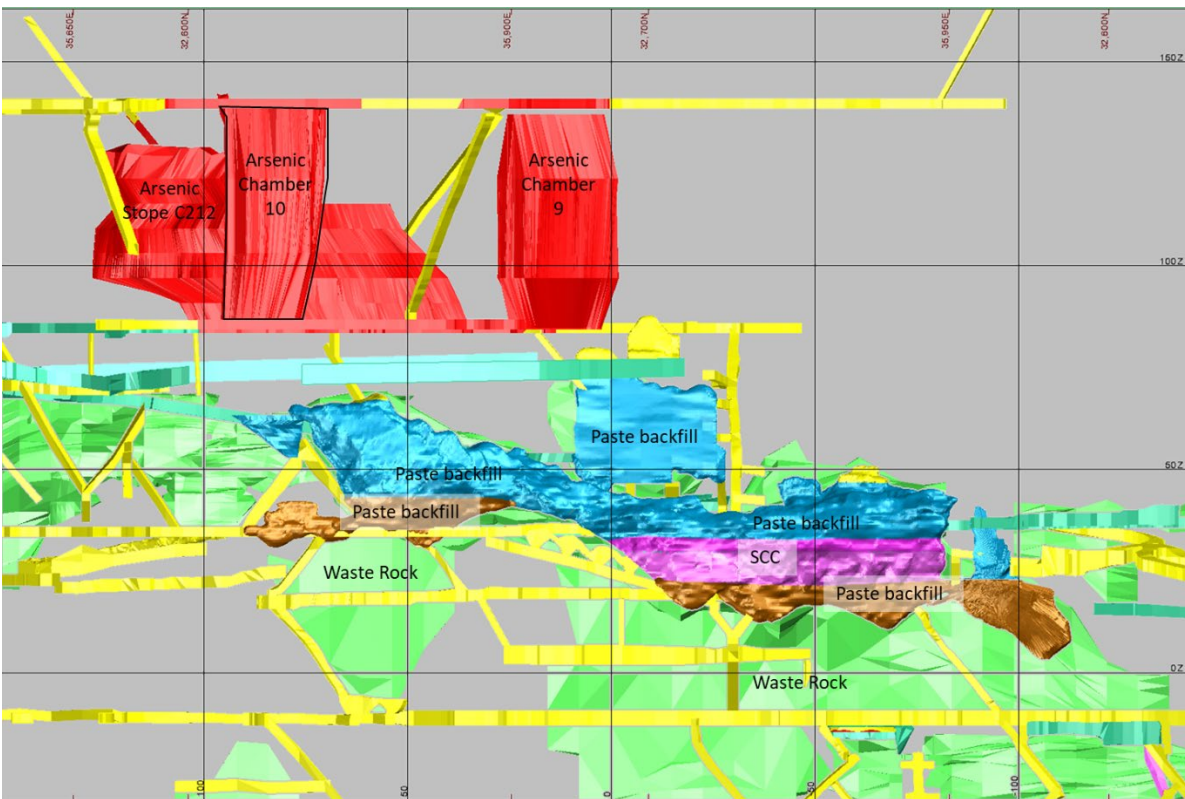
Long section view looking west of C509 stope complex and overlying arsenic storage. SCC sill pillar and paste backfill shown as well as historical waste rock
